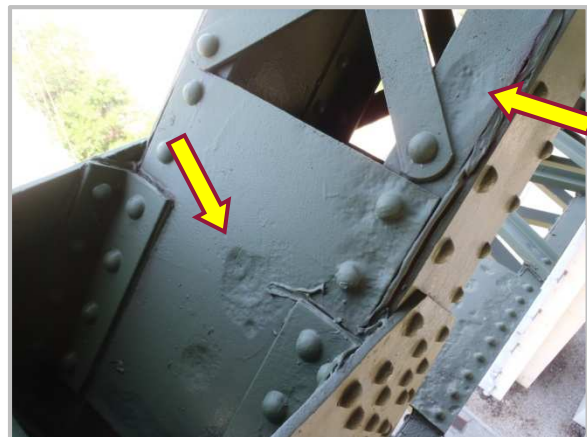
Pitting up to 1/4" deep on AL108-AU109 batten plate and top flange angle at lacing bar connection adjacent to lower chord gusset plate.
